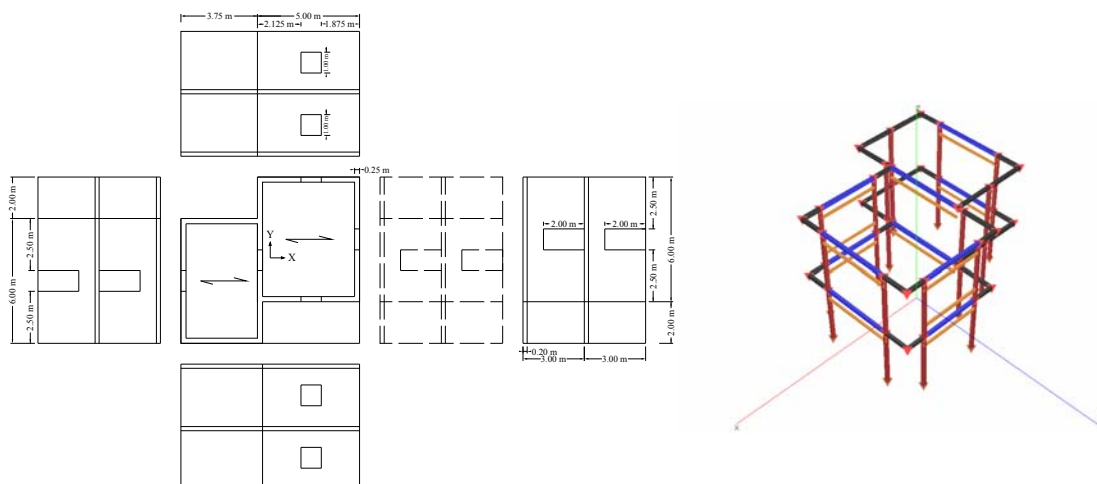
Building B: plan and views (left), and 3D frame generated by SAM (right)
